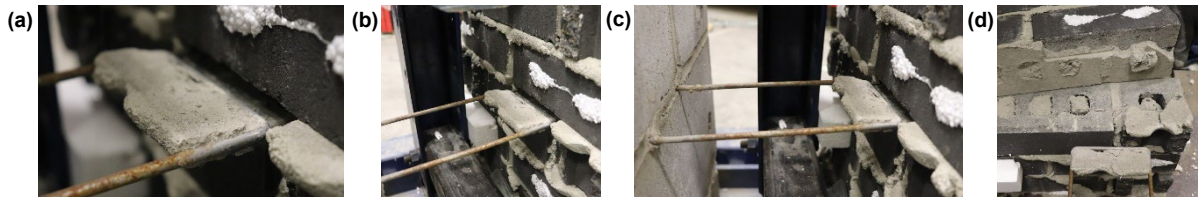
T-R.CN-3* after testing of (a) embedment failure, (b) zoomed out view of embedment failure, (c) side view of embedment failure, (d) horizontal mortar joint condition after connector removal
